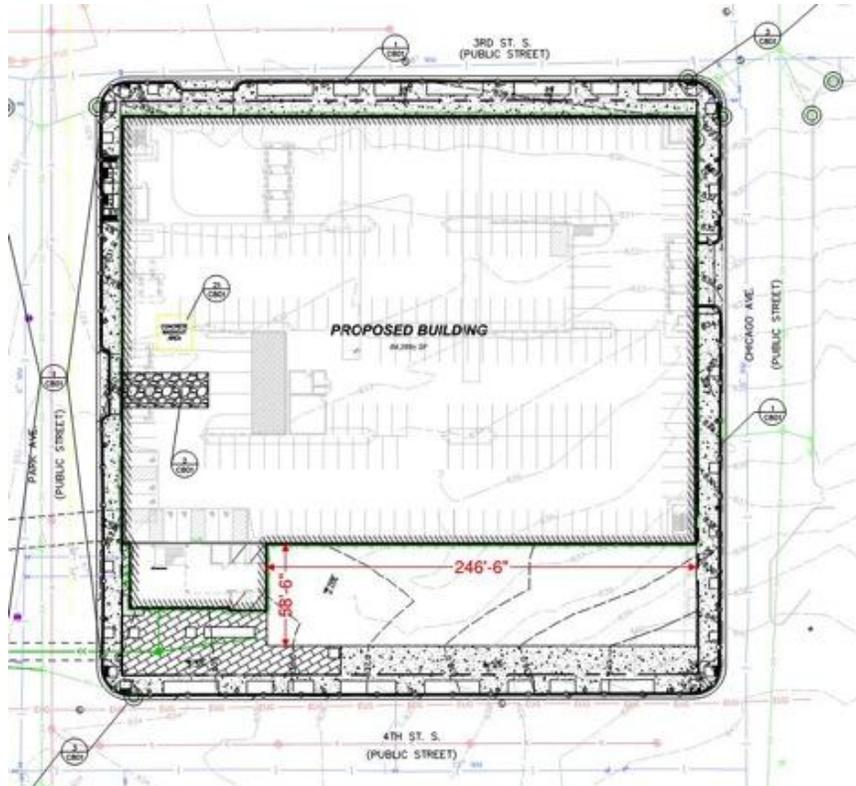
Conceptual site and ground floor plan of the Parking Ramp with the Liner Parcel on the bottom with dimensions in red. This plan is subject to change to reflect the final parking structure arrangement and the locations of ramp and service access.
